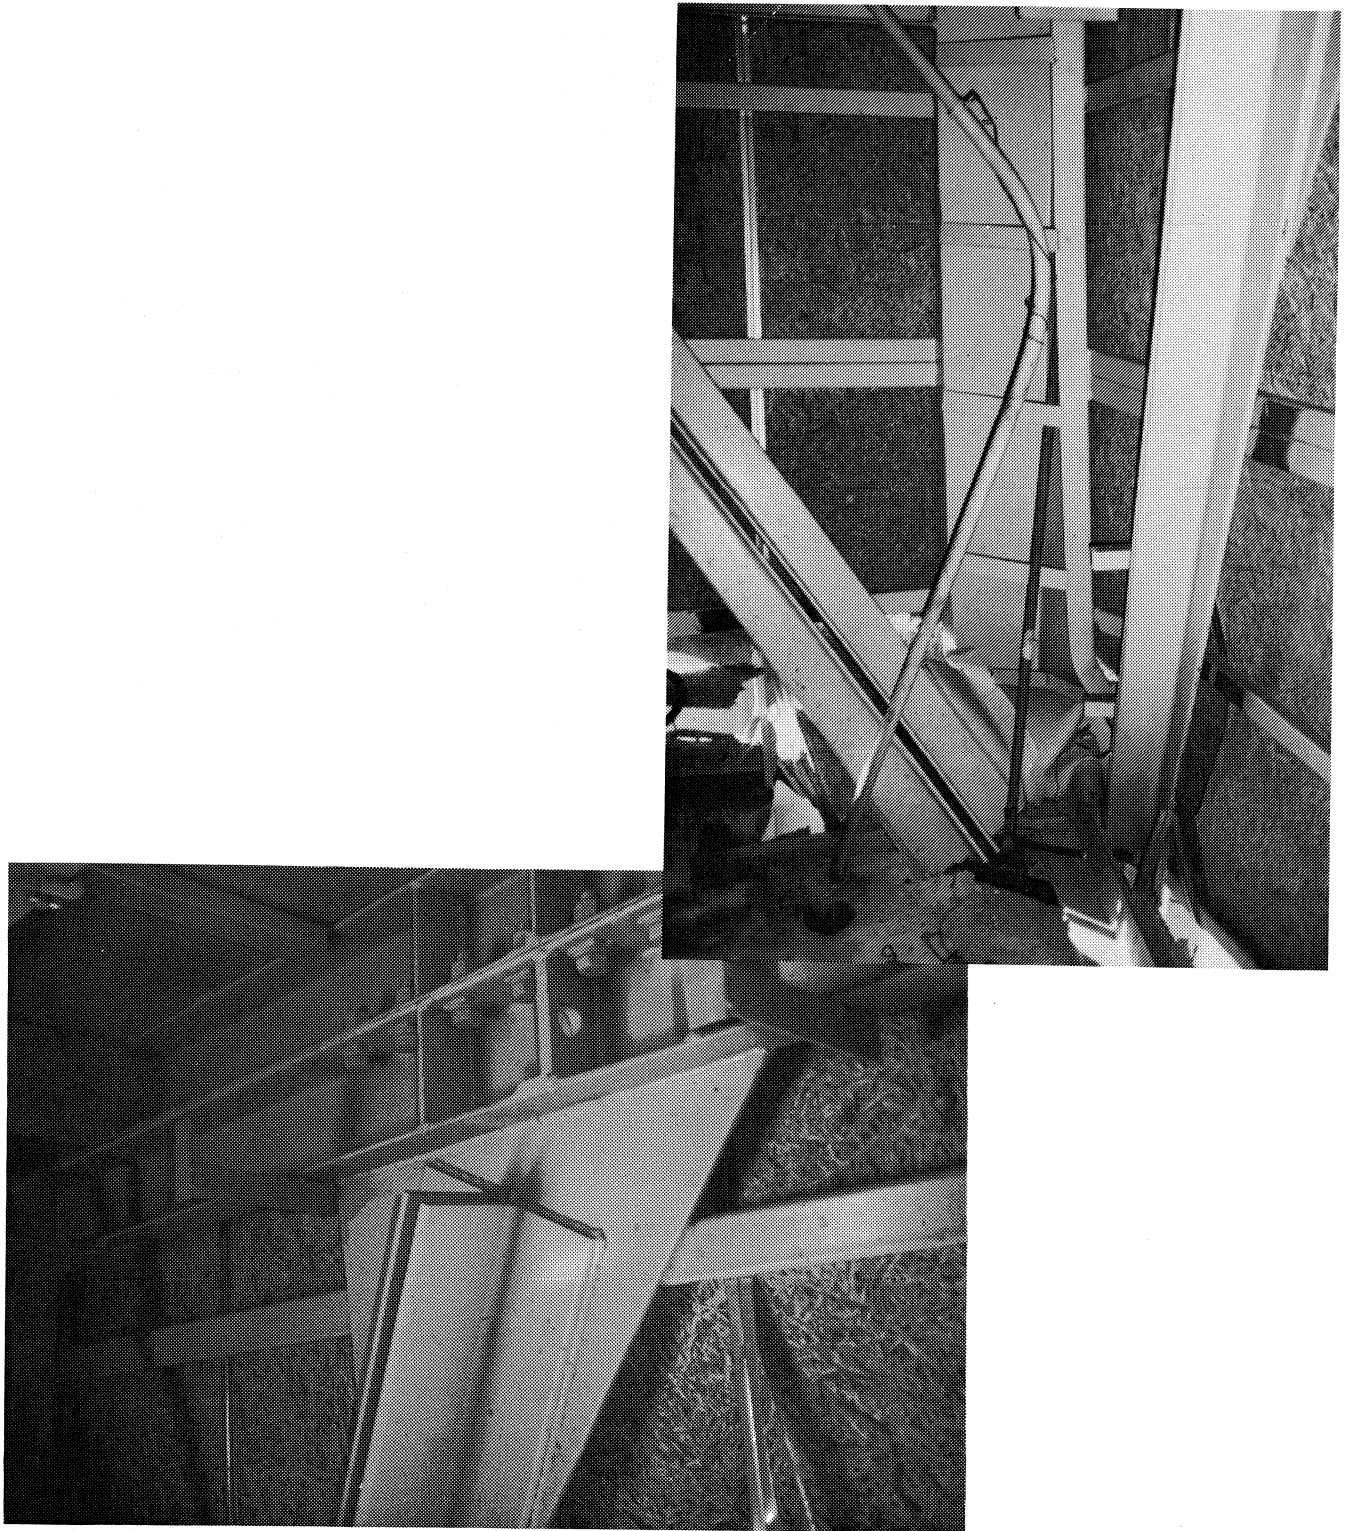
Interior view (upper photograph) of one of the four columns of the superstructure of the hopper at OCBP. The cold-formed corner thin-plate column has buckled and shortened by about 50 cm. Note that the seismic diagonal braces are undamaged. The hot-rolled angle diagonal steel braces are much heavier than the corner columns (about twice as thick). In effect, the designer designed against large earthquakes (lateral forces) but neglected to detail properly the vertical system. The lower photograph shows the well-detailed and undamaged brace connection.
